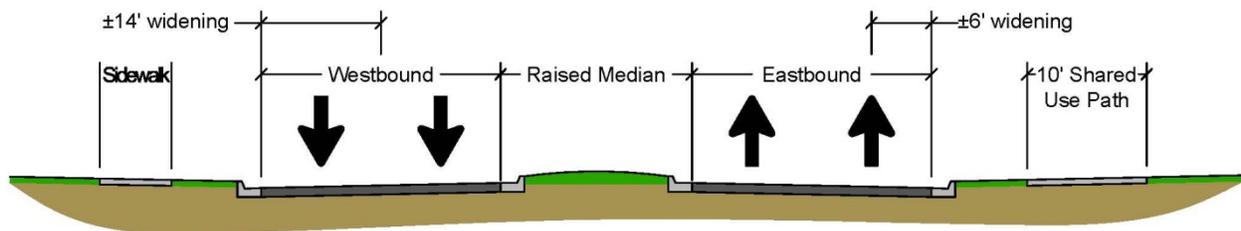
Option #1 – Proposed Kimball Avenue Typical Cross Section (Raised Median)
